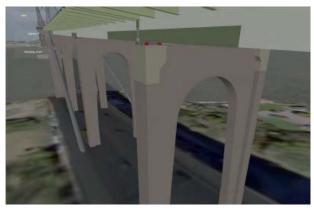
FORTH ROAD BRIDGE BEARING REPLACEMENT OPTION 5
